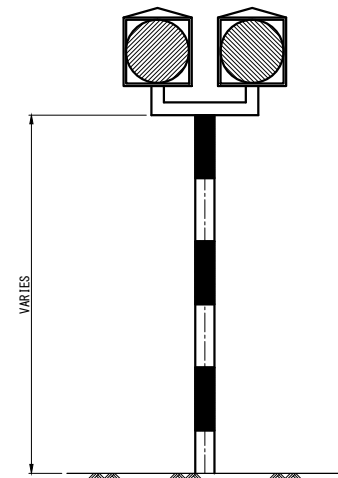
DETAILS OF SIGNAGE AND PAVEMENT MARKINGS
